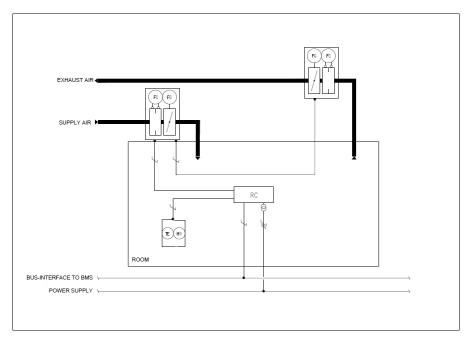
Wiring example for Halton Max MOS with a master-slave configuration In this example, the supply unit is controlling the exhaust unit.
